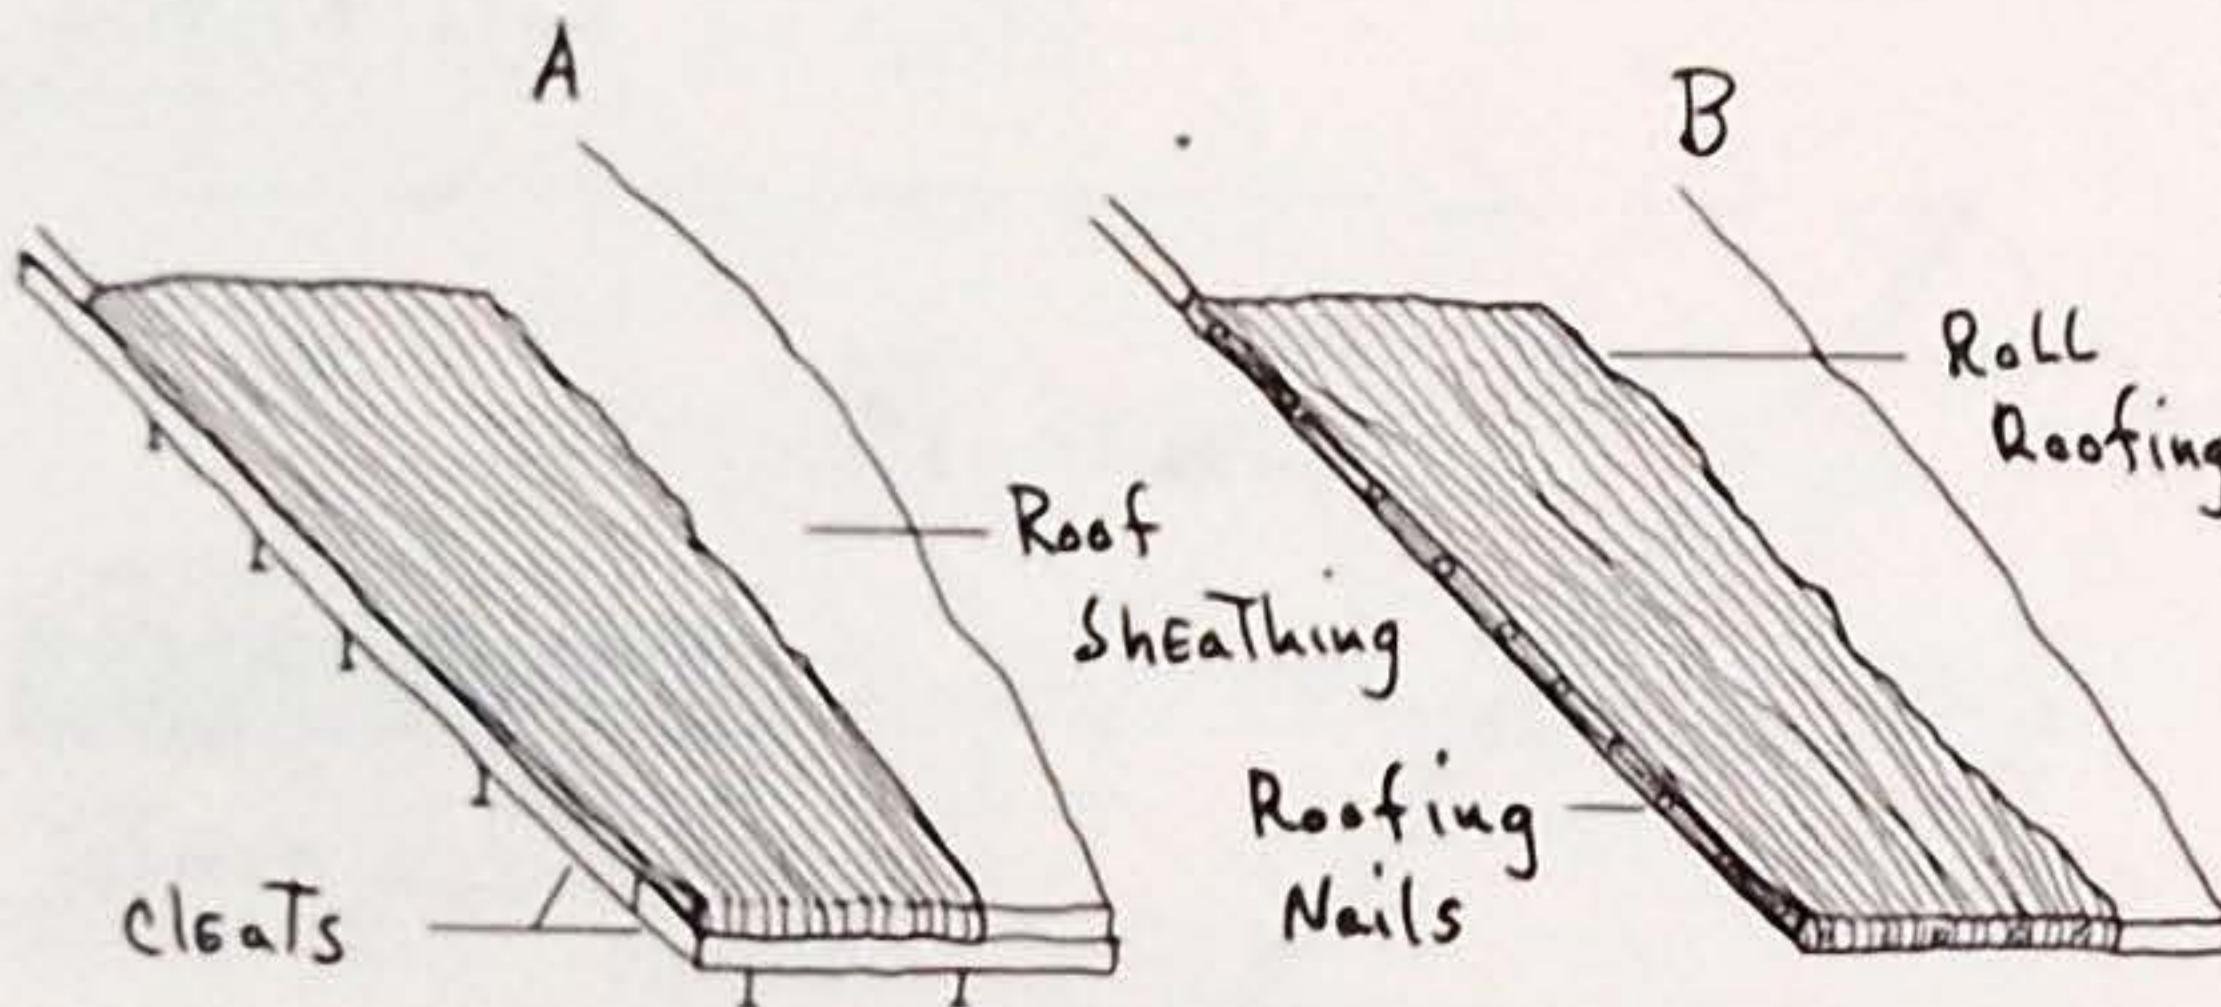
SECURING THE ROOFING AT THE EAVES
